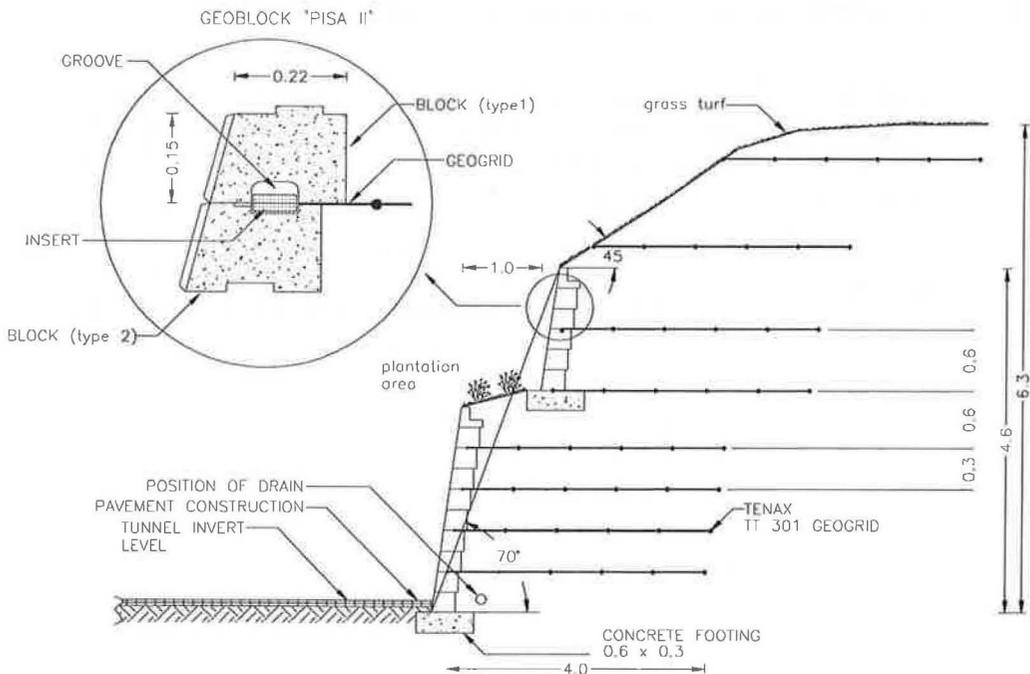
Geogrid-reinforced modular concrete block wall, Sevenoaks School, Kent.
